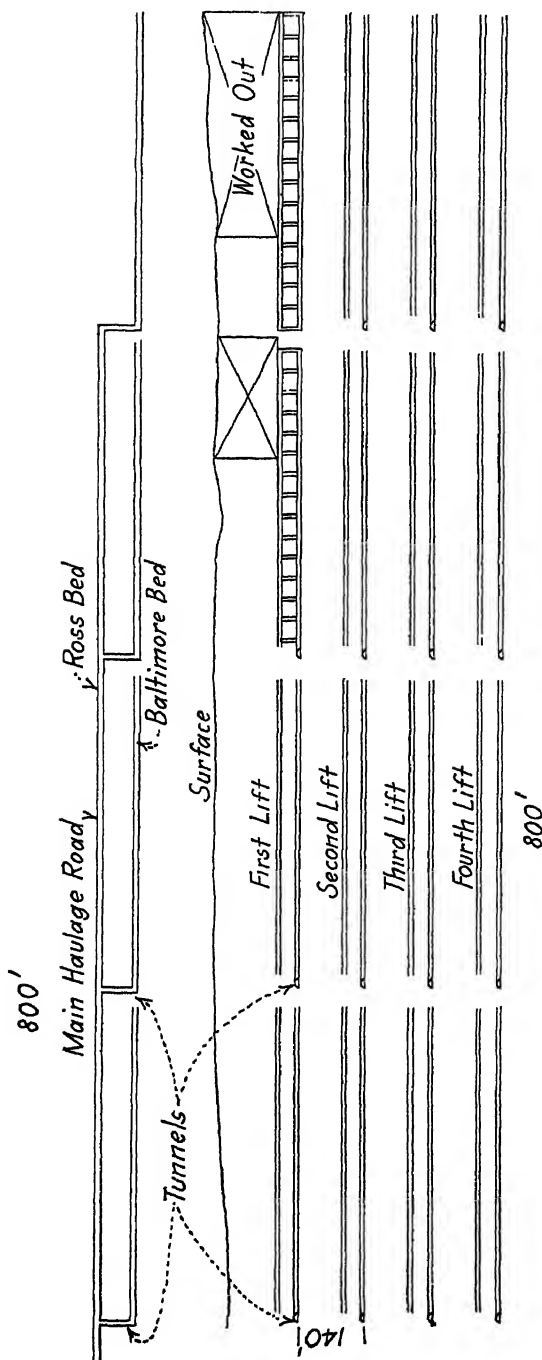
GENERAL PLAN OF LAYOUT OF WORKINGS OF WANAMIE COLLIERY.
